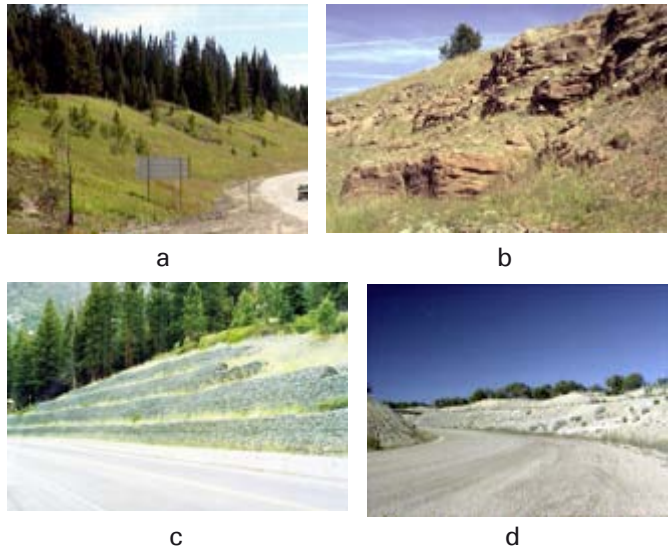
Proper and improper earthwork construction: a) Rounding the top and bottom of the slope and also undulating the face of the slope create a more natural-looking landscape; b) The split-face rock blasting technique used on this project creates a more natural-looking rock face; c) The rock gabion treatment of this hillside creates strong contrasts in line and color; d) This typical highway construction side slope treatment creates an unnatural form in the landscape.
